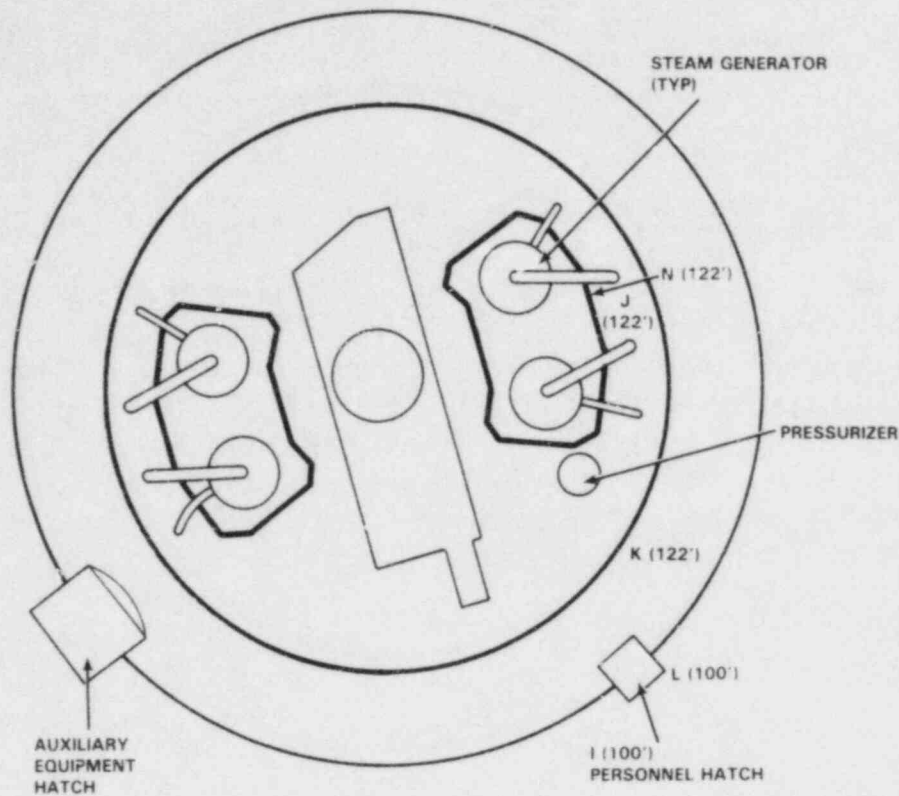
Containment Layout at the 122-ft Elevation for the Operating PWR, Site K. Measurements were performed at locations I through L and N at the elevations shown in parentheses.
